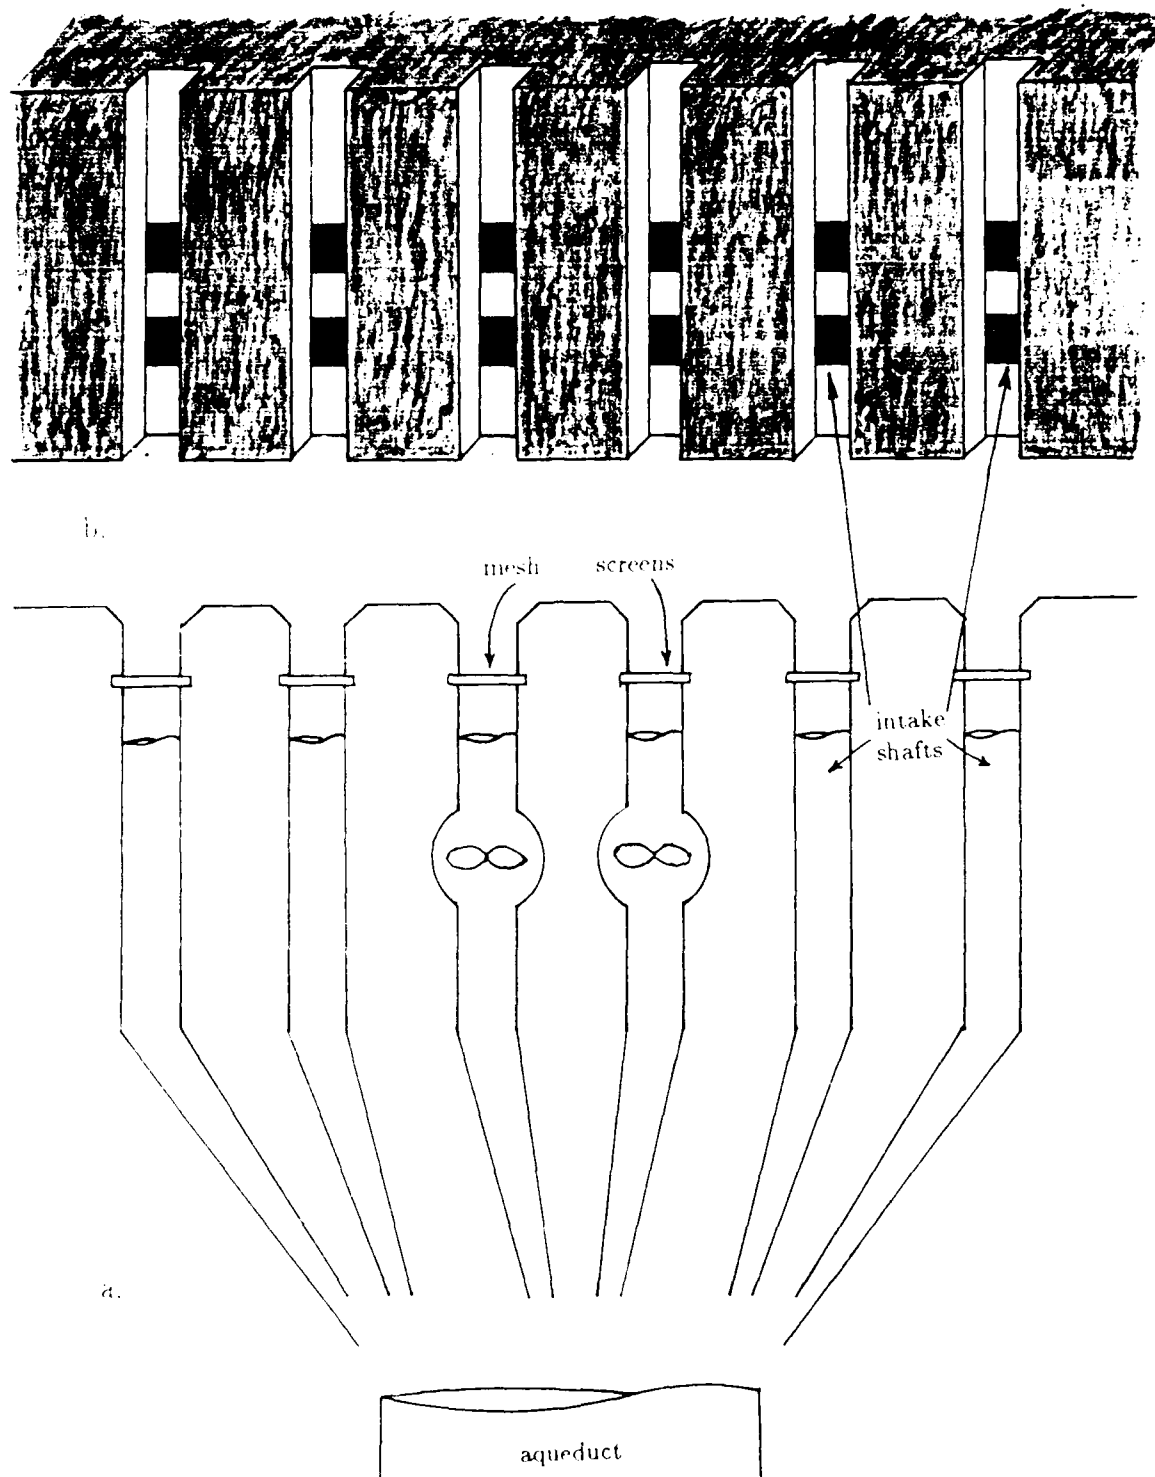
Cosgrove intake geometry: a. plan view showing cut out channels and placement of mesh screens, b. elevation view depicting a double row of intakes.
